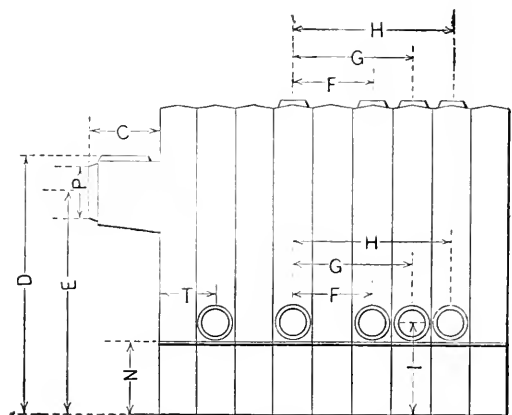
Side View. For details of measurement see Table 5. Boilers are so designed that any casting, whether round or square, may be taken through any door or opening which is not less than 2 feet 6 inches wide.
